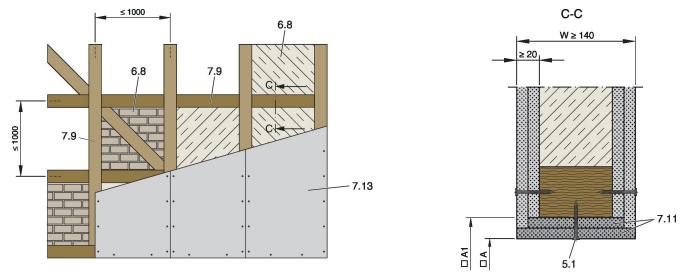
Lightweight partition wall, half-timbered construction with cladding on both sides
